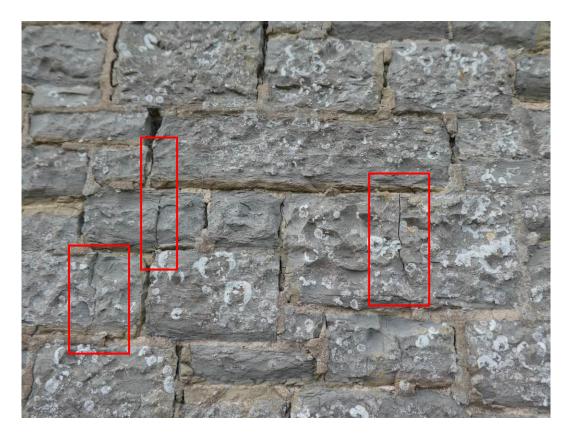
P1000264 Masonry Fractures Associated with Structural Movement Open Joints in North Elevation 3rd Stage
